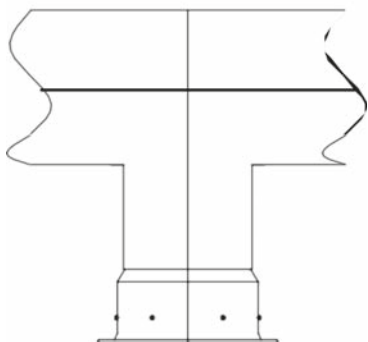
INSTALLATION ON DUCT WITH CONNECTING SLEEVE
